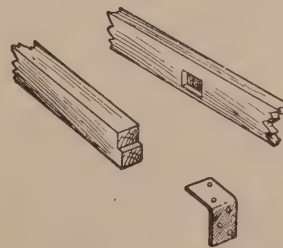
Detail of Cross Bearer and Joint with Angle-iron
